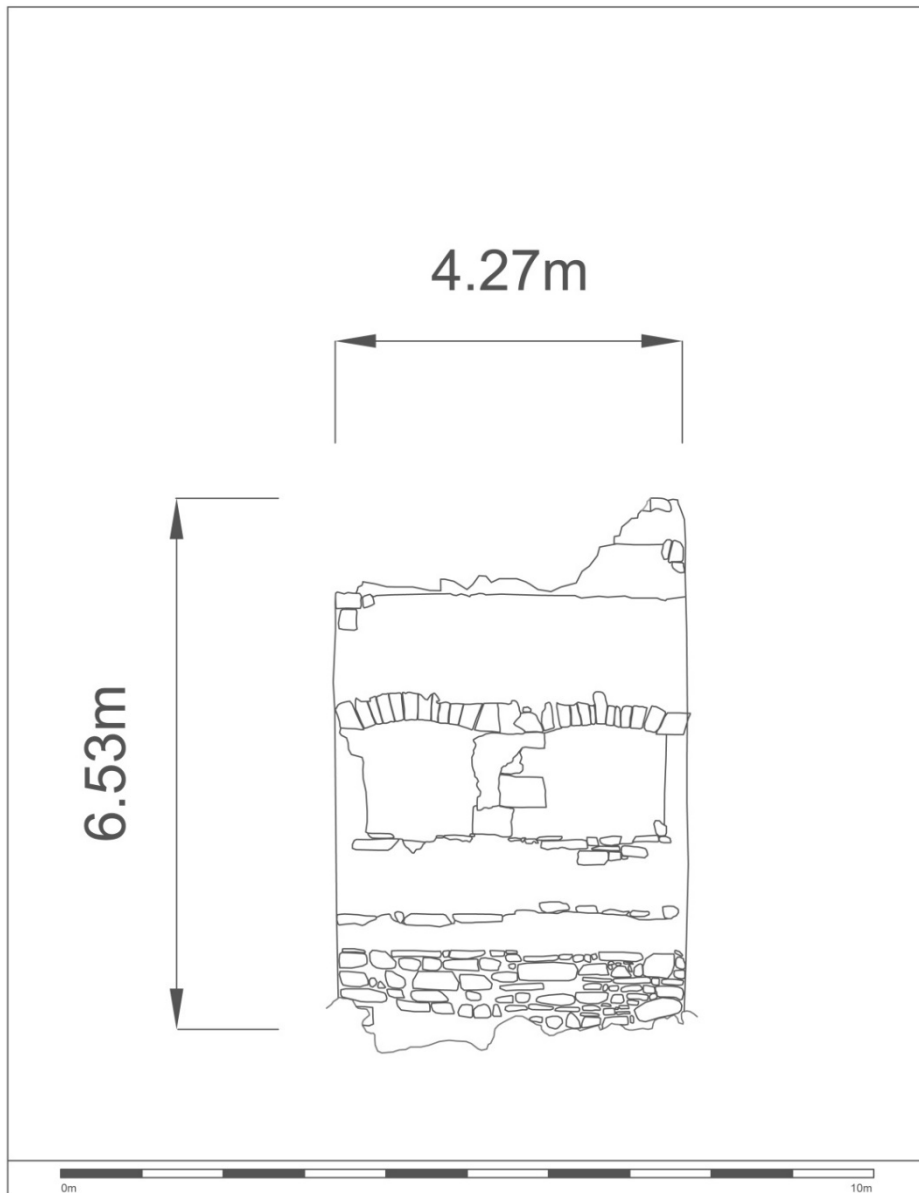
Internal elevation of the south wall of Clare Island Signal Tower.
